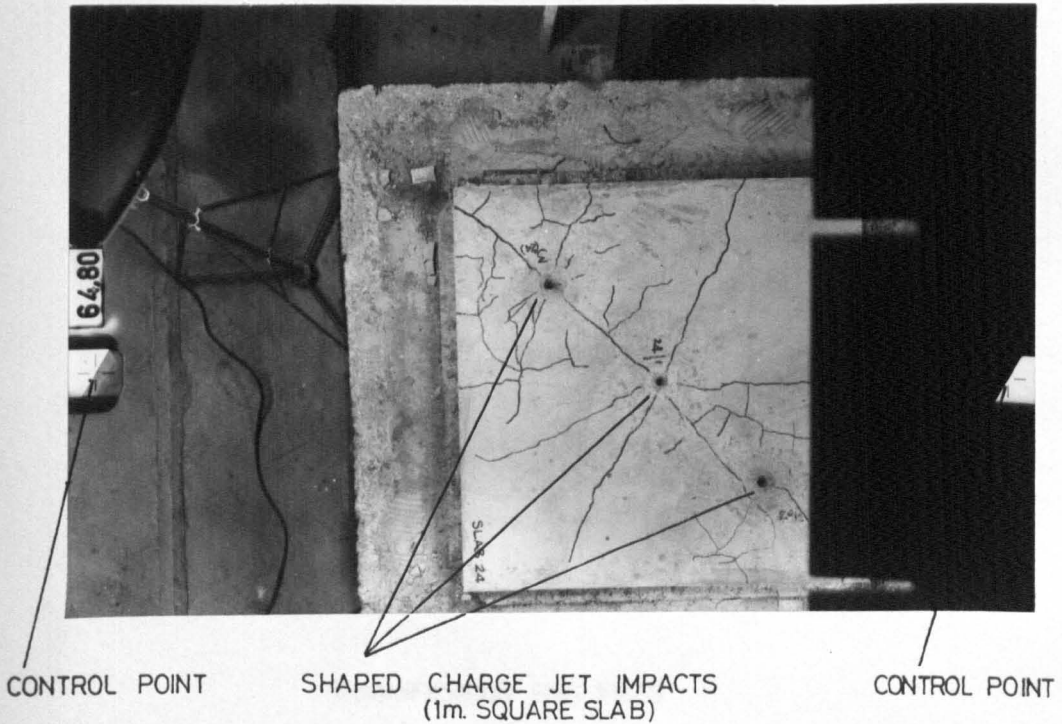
TYPICAL STEREO CAMERA FRAME
